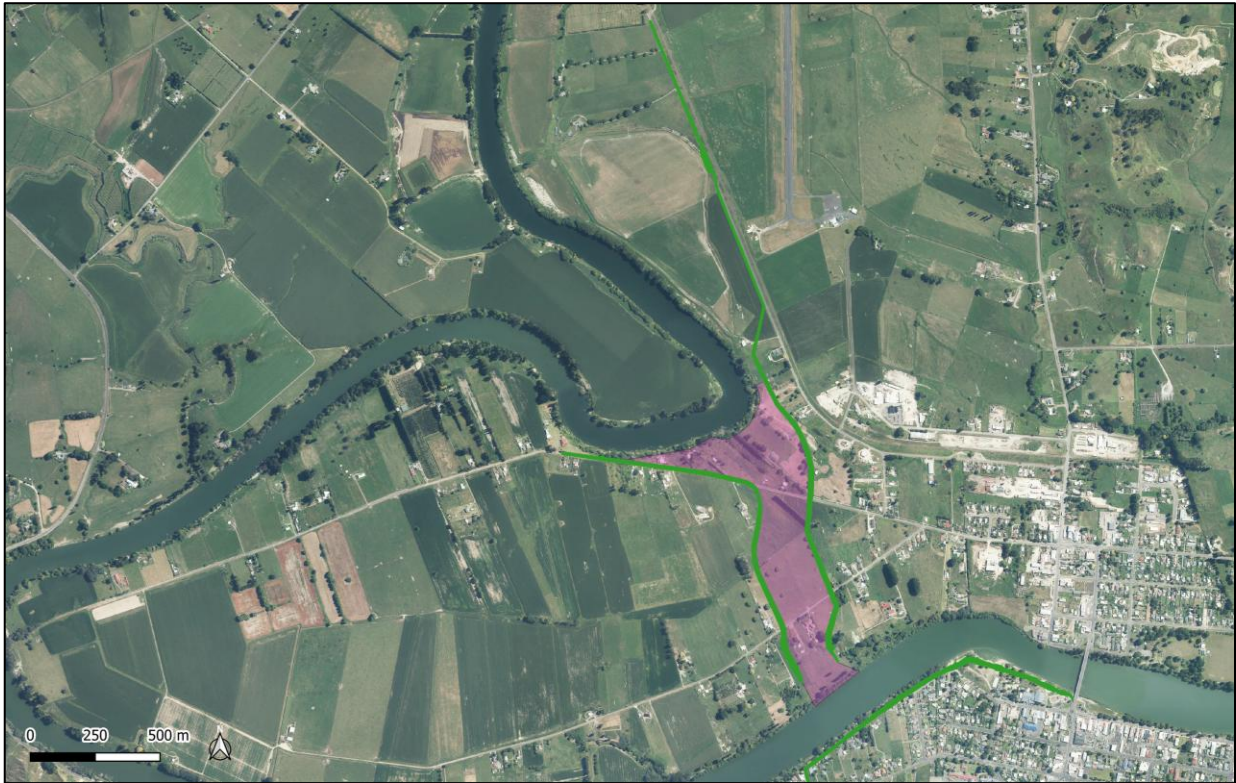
Overall plan of the proposed Wairoa Floodway project. Green lines are the stopbanks, pink polygon is the proposed floodway (adapted from plan supplied by WSP).
